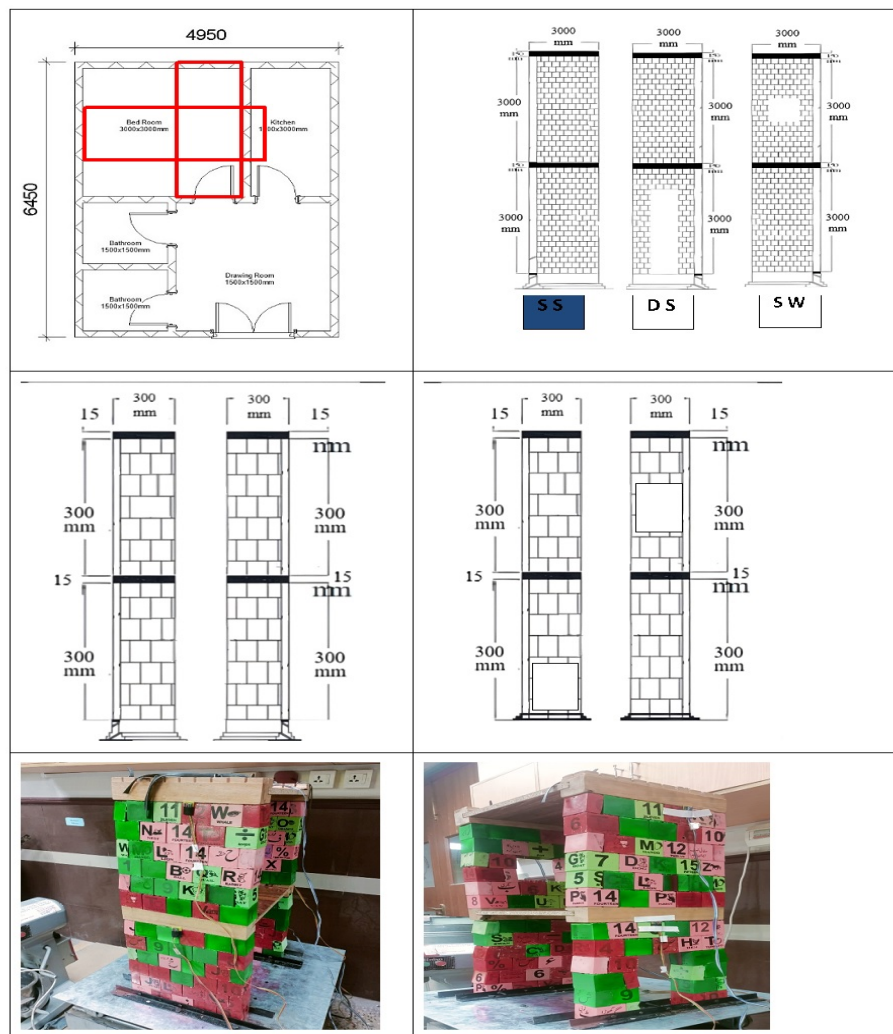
Consideration of In Plane: (a) plan and elevation of house with original In Plane consideration, (b) scaled down and simplified boundary conditions and (c) In Plane with configuration sequence A and B.
